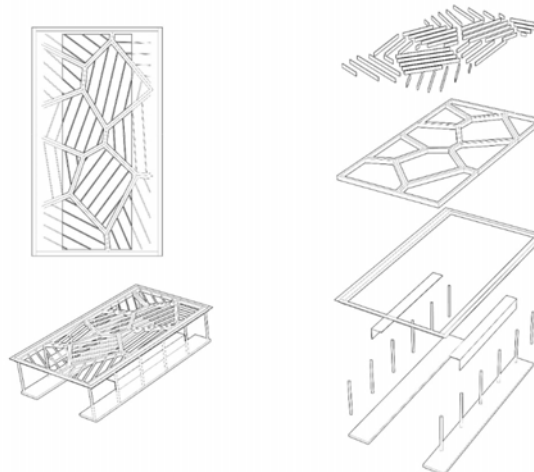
An exploded view of a passing canopy highlighting the structure and sunscreens.
